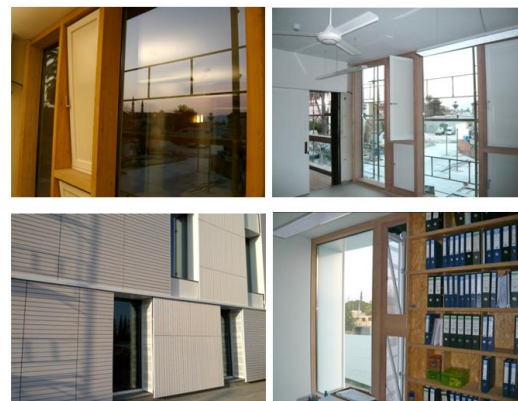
top: tilted north façade vent, north façade open regular, bottom: south window from outside, south vent from inside.
